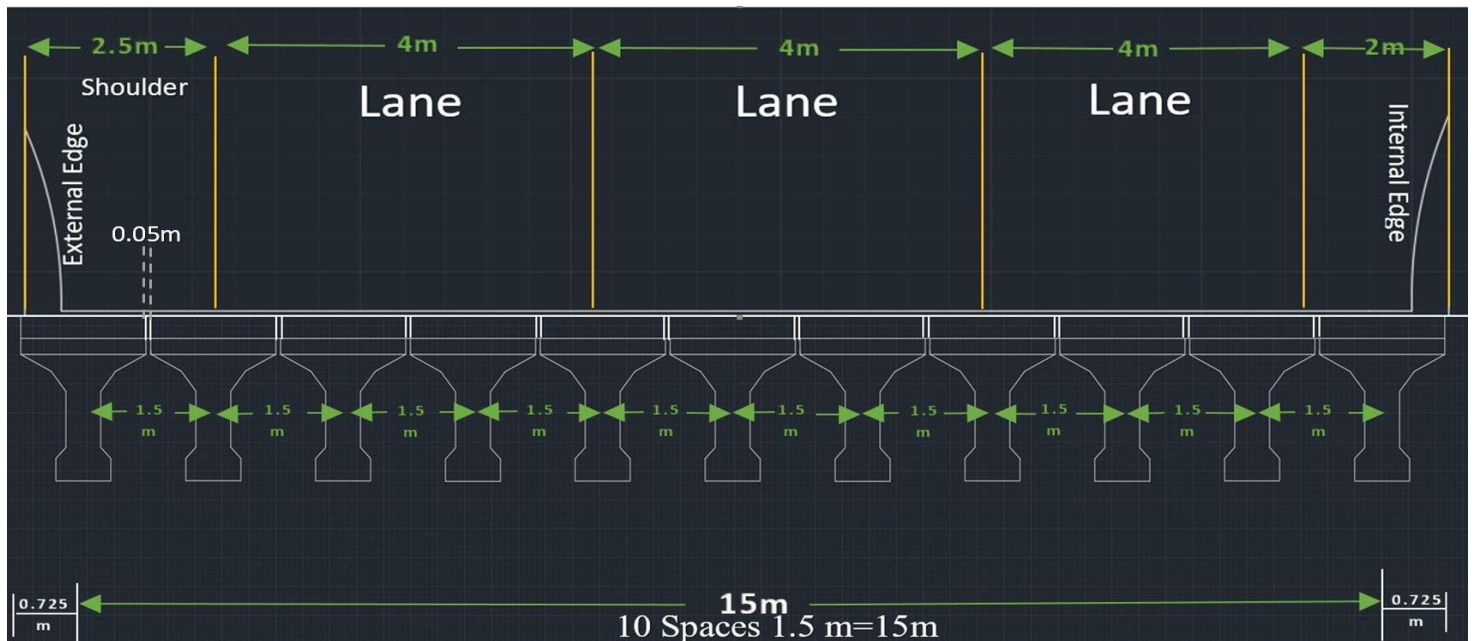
Cross Section of Post-Tensioned Concrete Bridge
